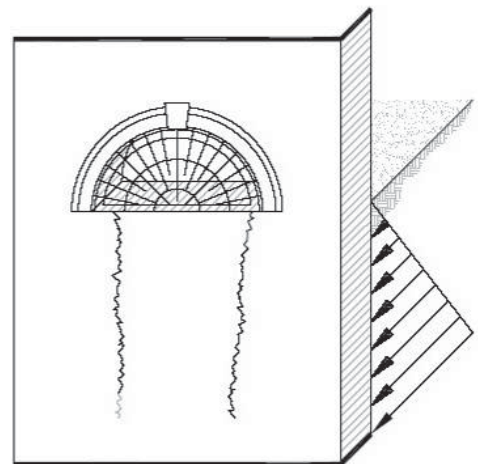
Below the window arcade on the south elevation the wall is retaining the south lawn.
